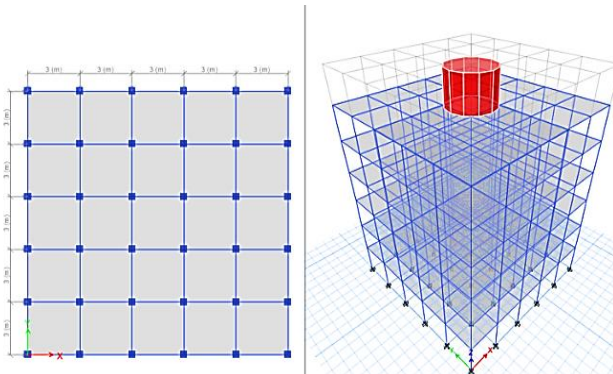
2D&3D Plan view of structure with cylindrical shape TLD
